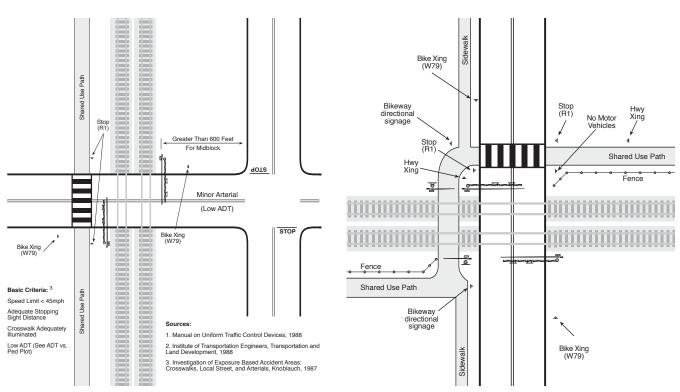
Roadway crossing type 3 (unprotected crossing)
